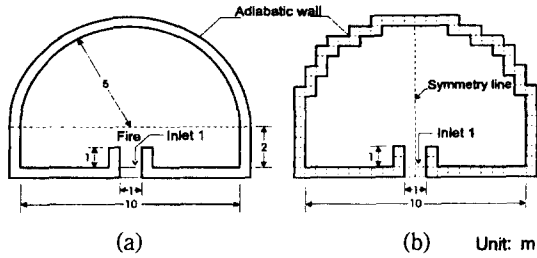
Cross section of real & model tunnel at 200 m. (a) Real tunnel, (b) 3D model tunnel unit: m
